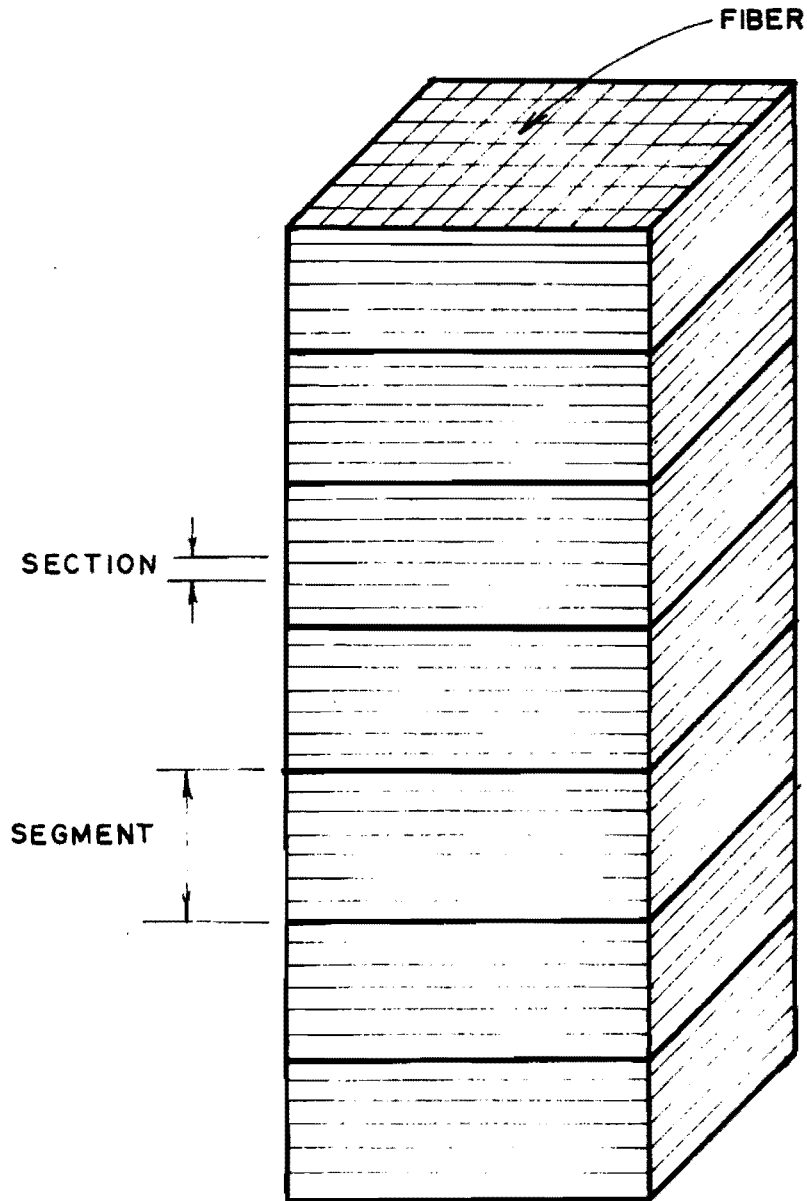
Fiber model representation of a rectangular solid prismatic bridge pier
